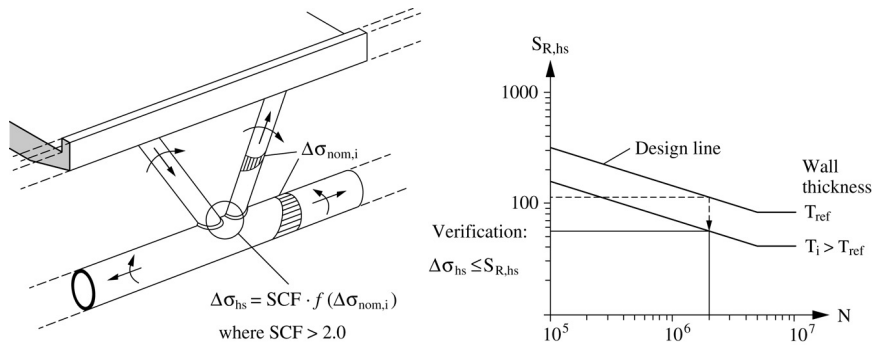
Fatigue design of welded CHS joints, load effects and resistance.
